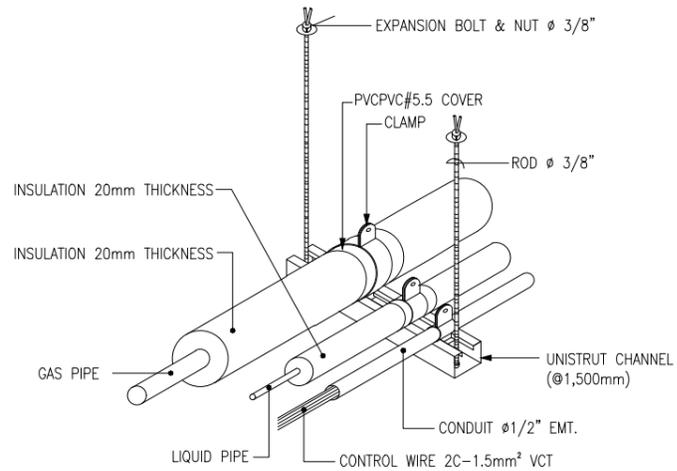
TYPICAL DETAIL FOR REFRIGERANT INSTALLATION
